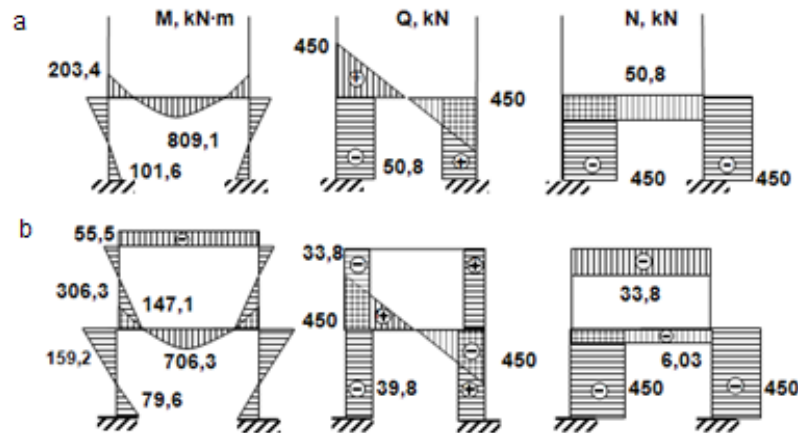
Results of frame calculation for girder loading of the 1st floor:
